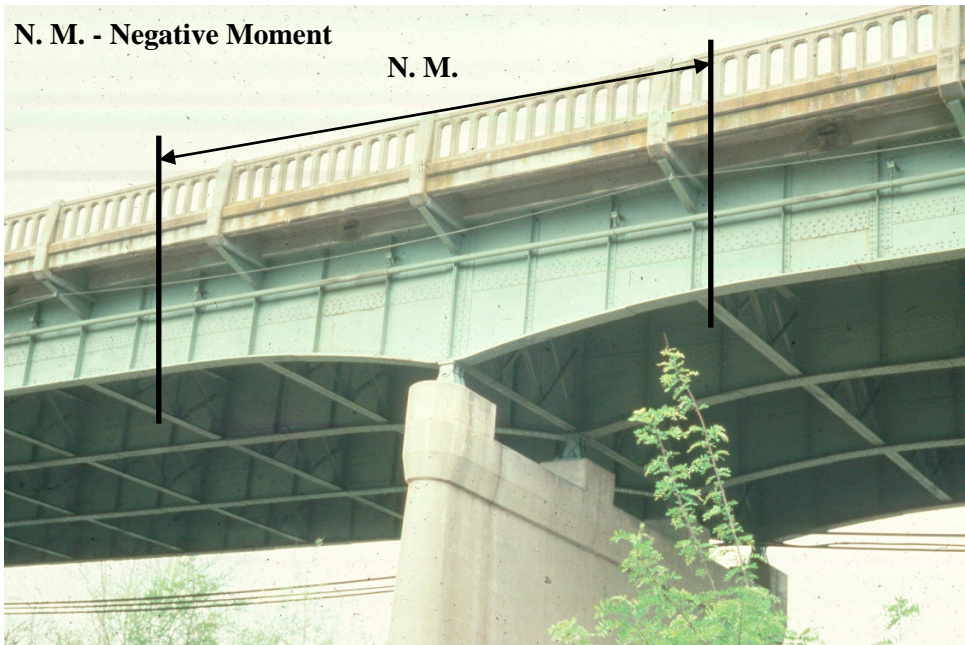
Negative Moment Region on a Continuous Span Fabricated Multi-Girder Bridge
